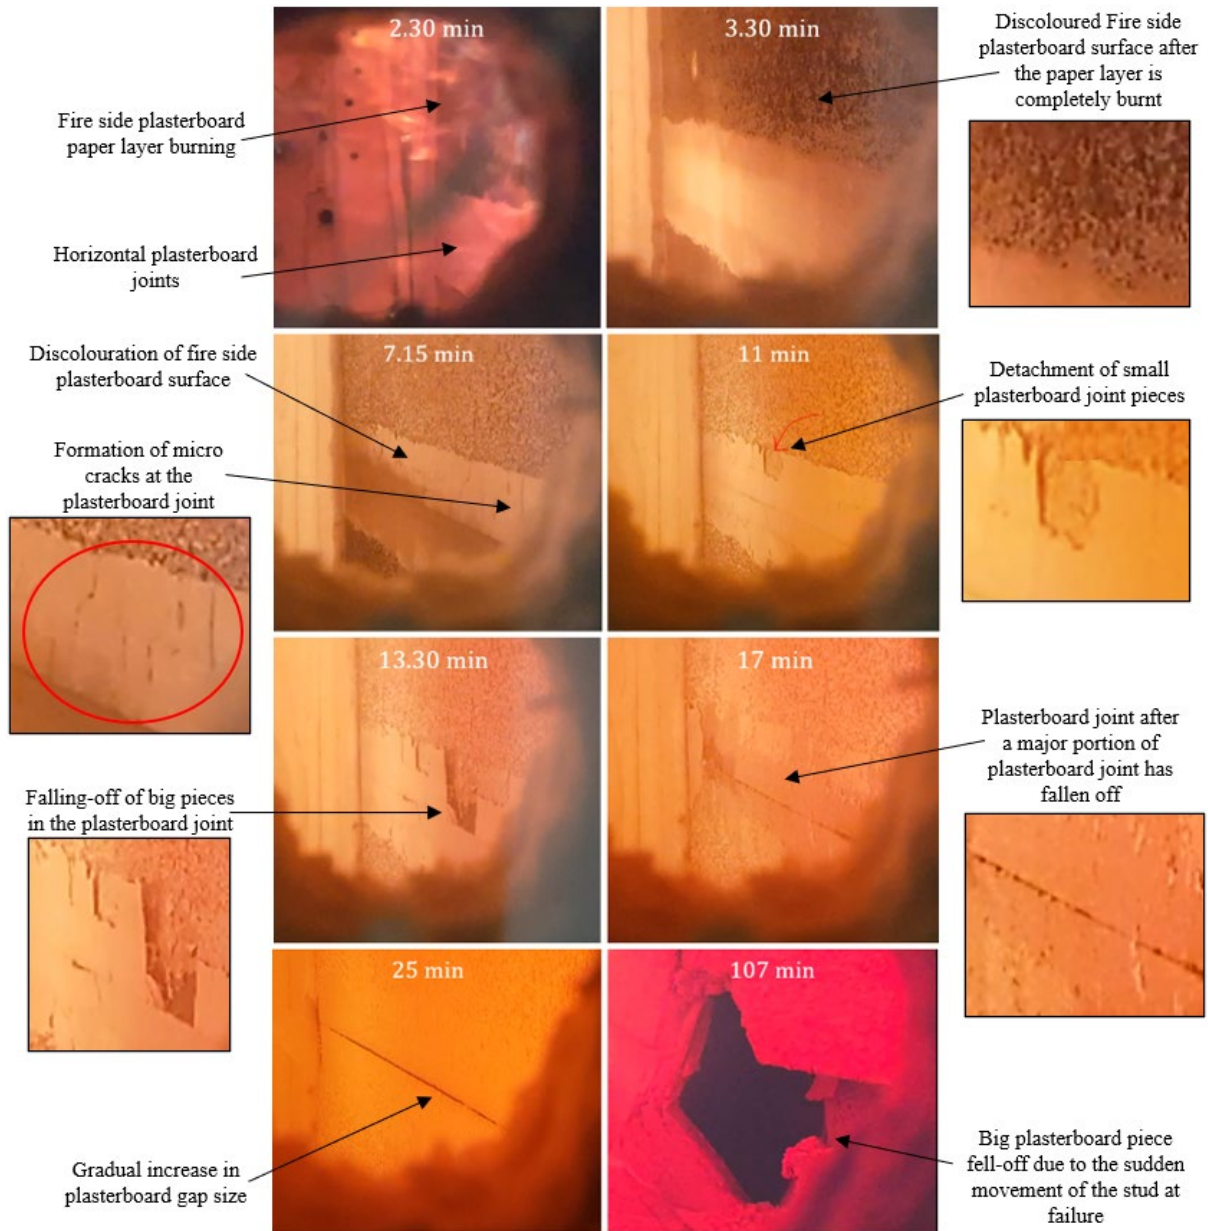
Observations of fire side plasterboard of double plasterboard sheathed wall panel in Fire Test T3.
